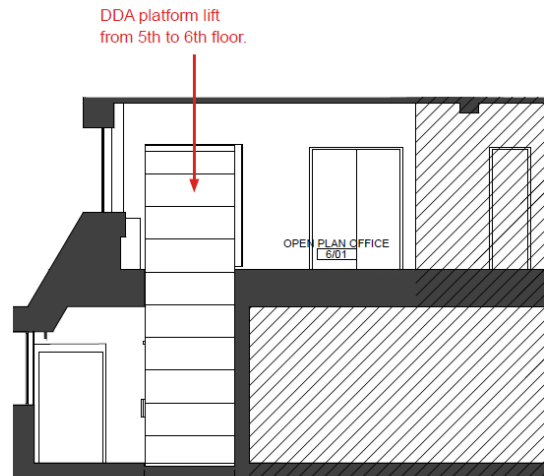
Proposed Section, showing the proposed Internal DDA Platform Lift, prepared by WRA
